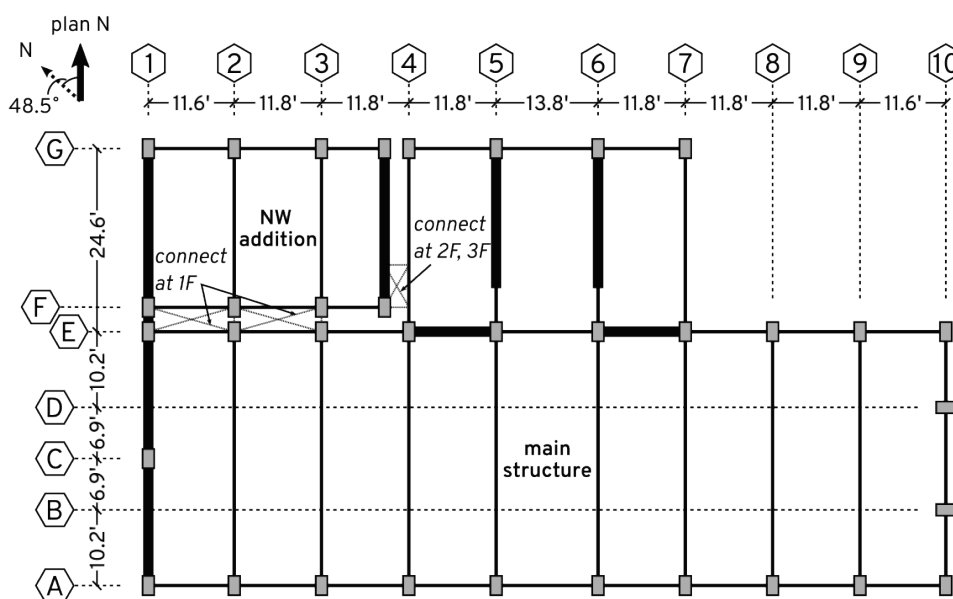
Plan dimensions of building. Thickened lines indicate full-height masonry-infill walls.
